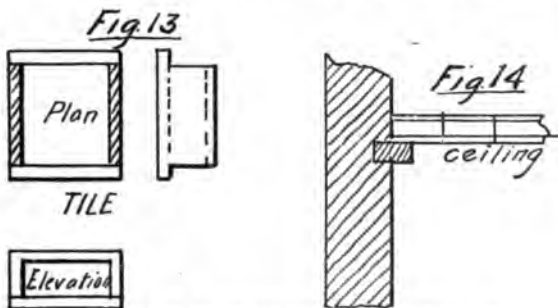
Iron Beams and Concrete or Brick Arches.
